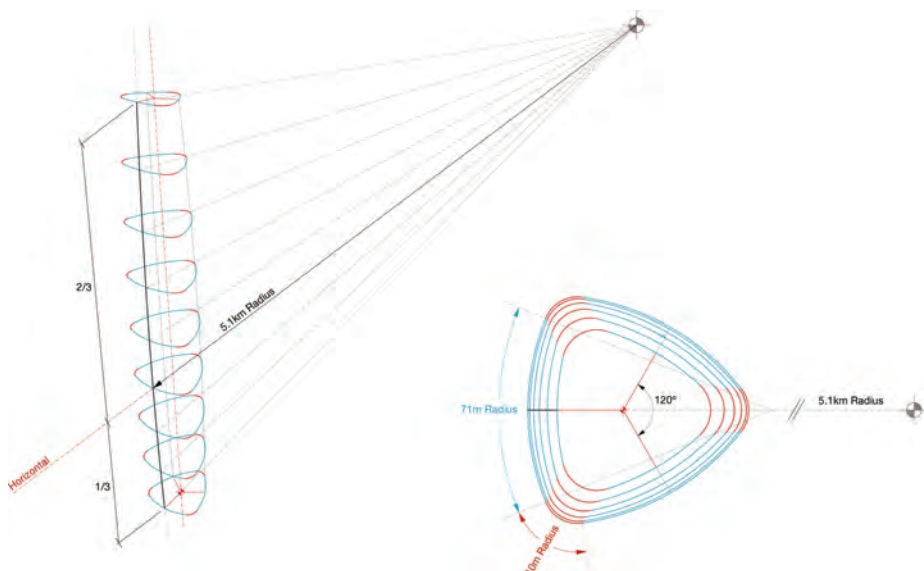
Setting out geometry for the tower (Source: Wilkinson Eyre Architects)
